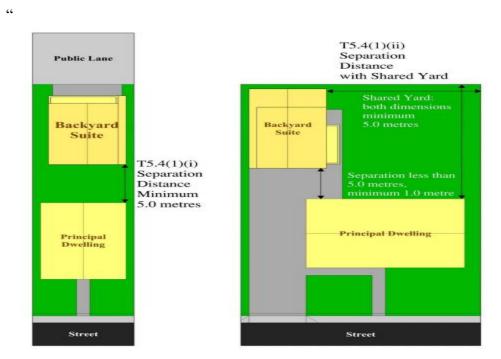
D.F2A: Setback from Primary Building for Dwelling, Backyard Suite"
